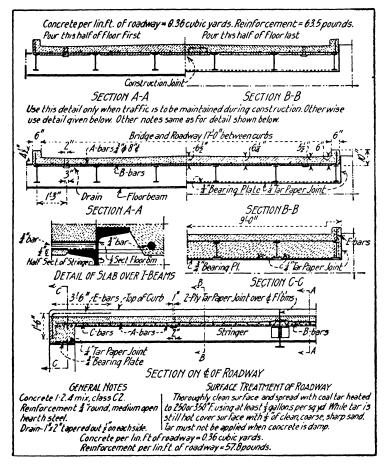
REINFORCED CONCRETE FLOOR, MICHIGAN HIGHWAY COMMISSION.
